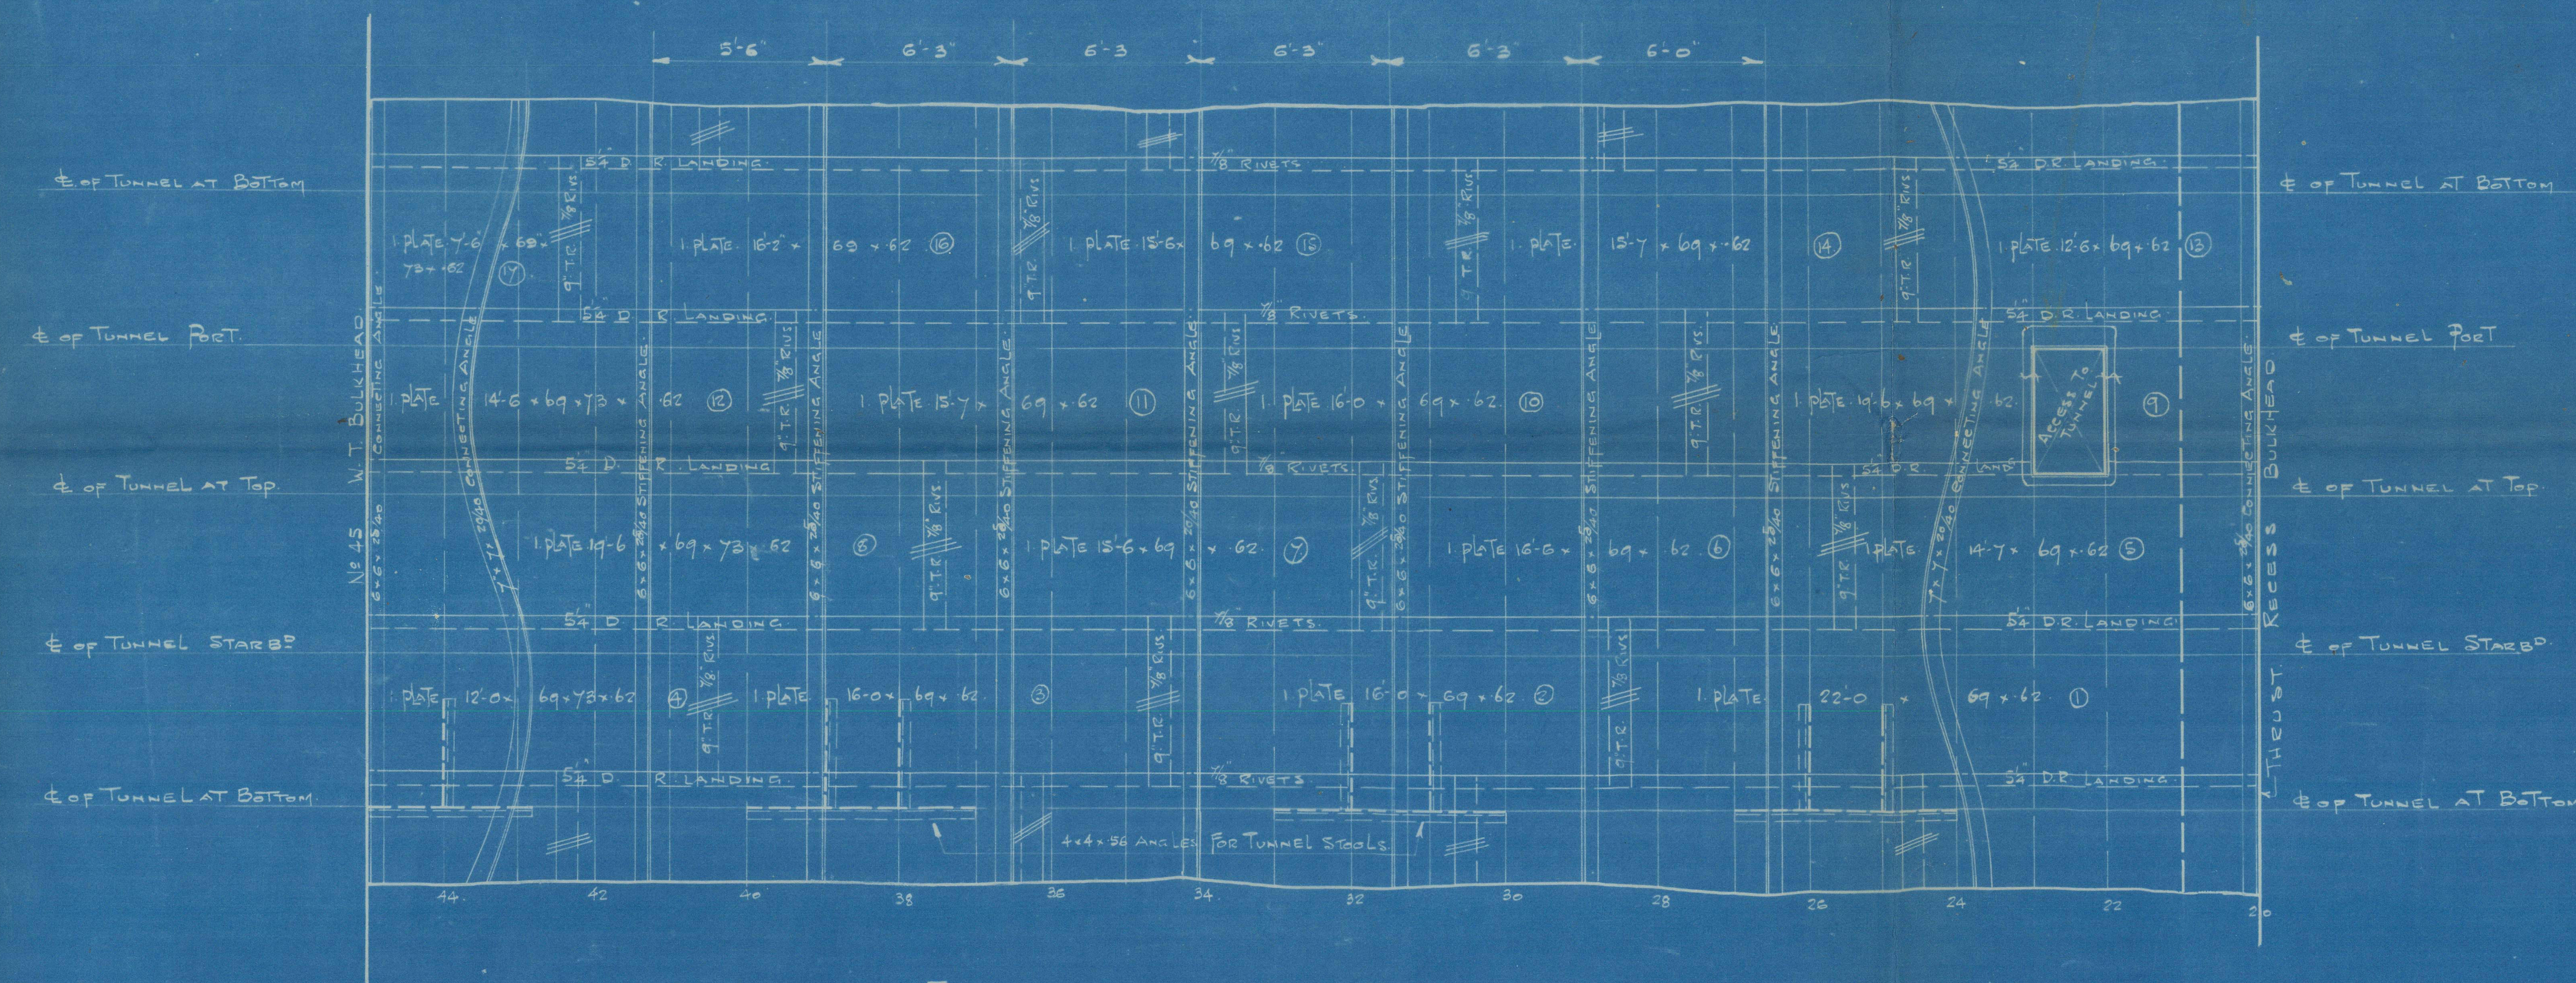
41	50	TUNNEL BEAMS, T.S.
